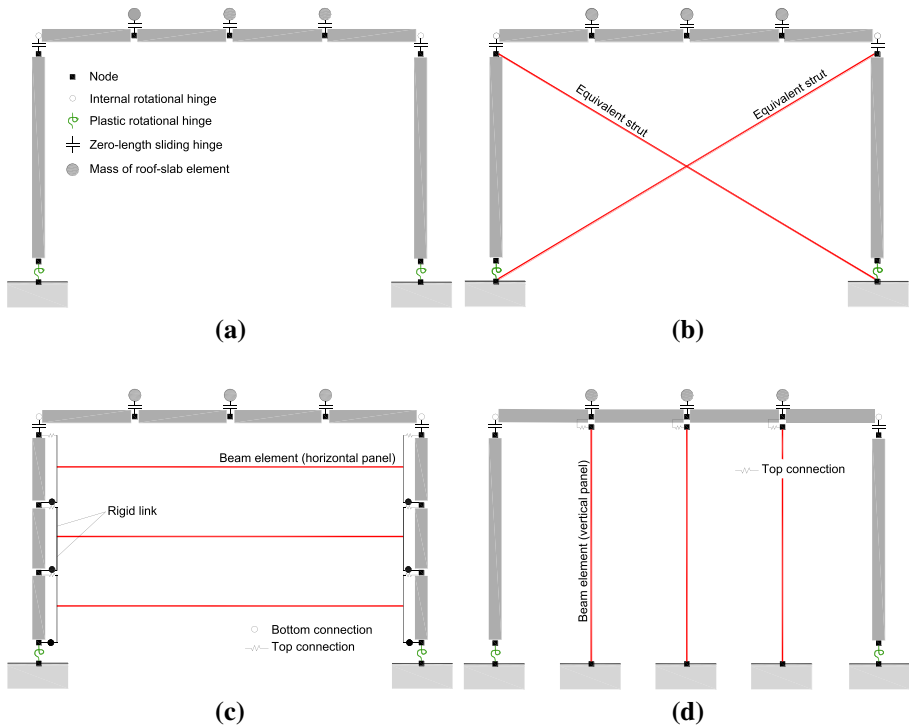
FE modelling of the different frame typologies: a INTERNAL frame; Perimeter frame with b Masonry infill WALLS, c Horizontal cladding panels and d vertical cladding panels
